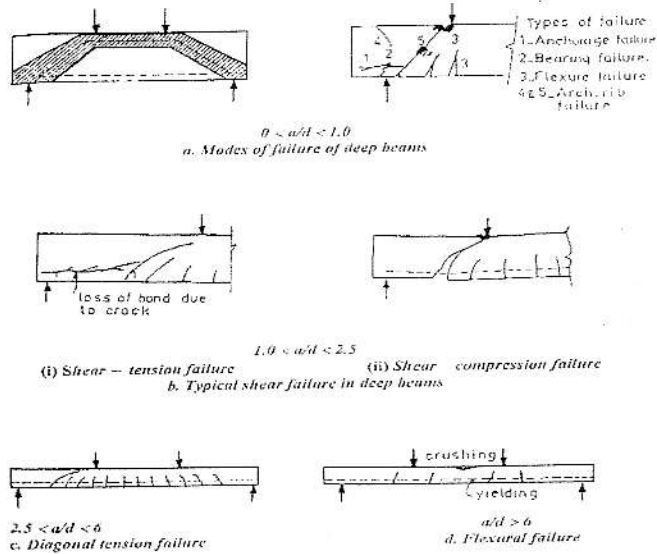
Mode of failure of reinforced concrete beams with different a/d ratios⁽¹¹⁾
